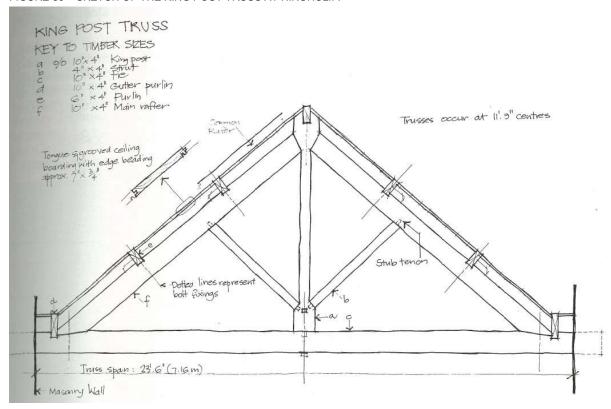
SKETCH OF THE KING POST TRUSS AT HINCHCLIFF
